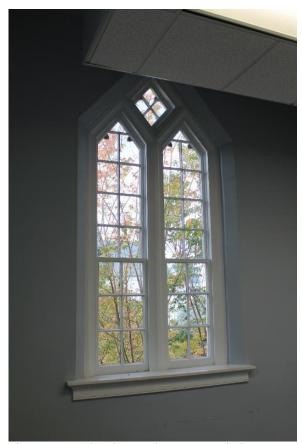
, Historic Courthouse, Second Floor, Room 216, view of window at north wall.
